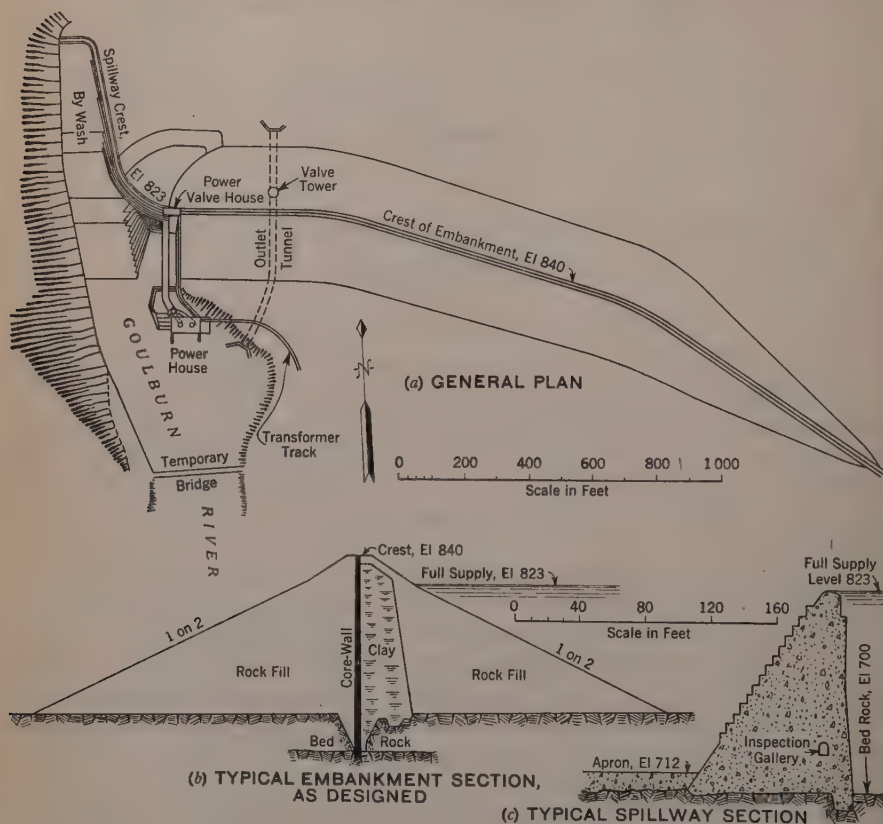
TYPICAL CROSS-SECTIONS, EILDON RESERVOIR
